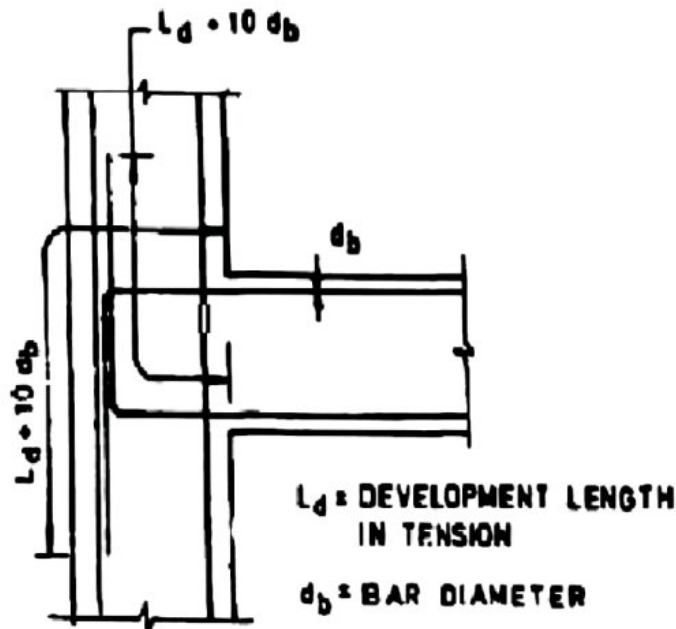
ANCHORAGE OF BEAM BARS IN AN EXTERNAL JOINT
